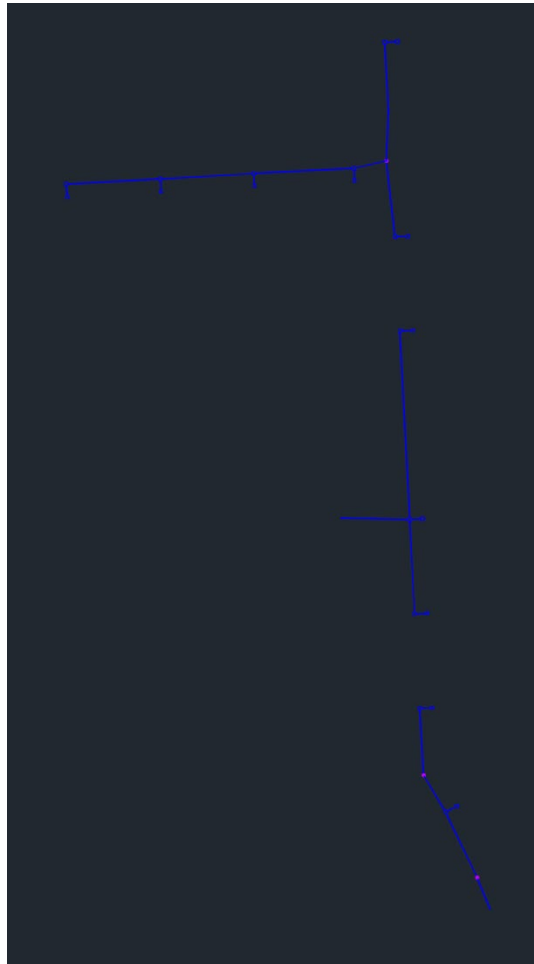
Screenshot of storm sewer layout, including manhole and intake spacing.
